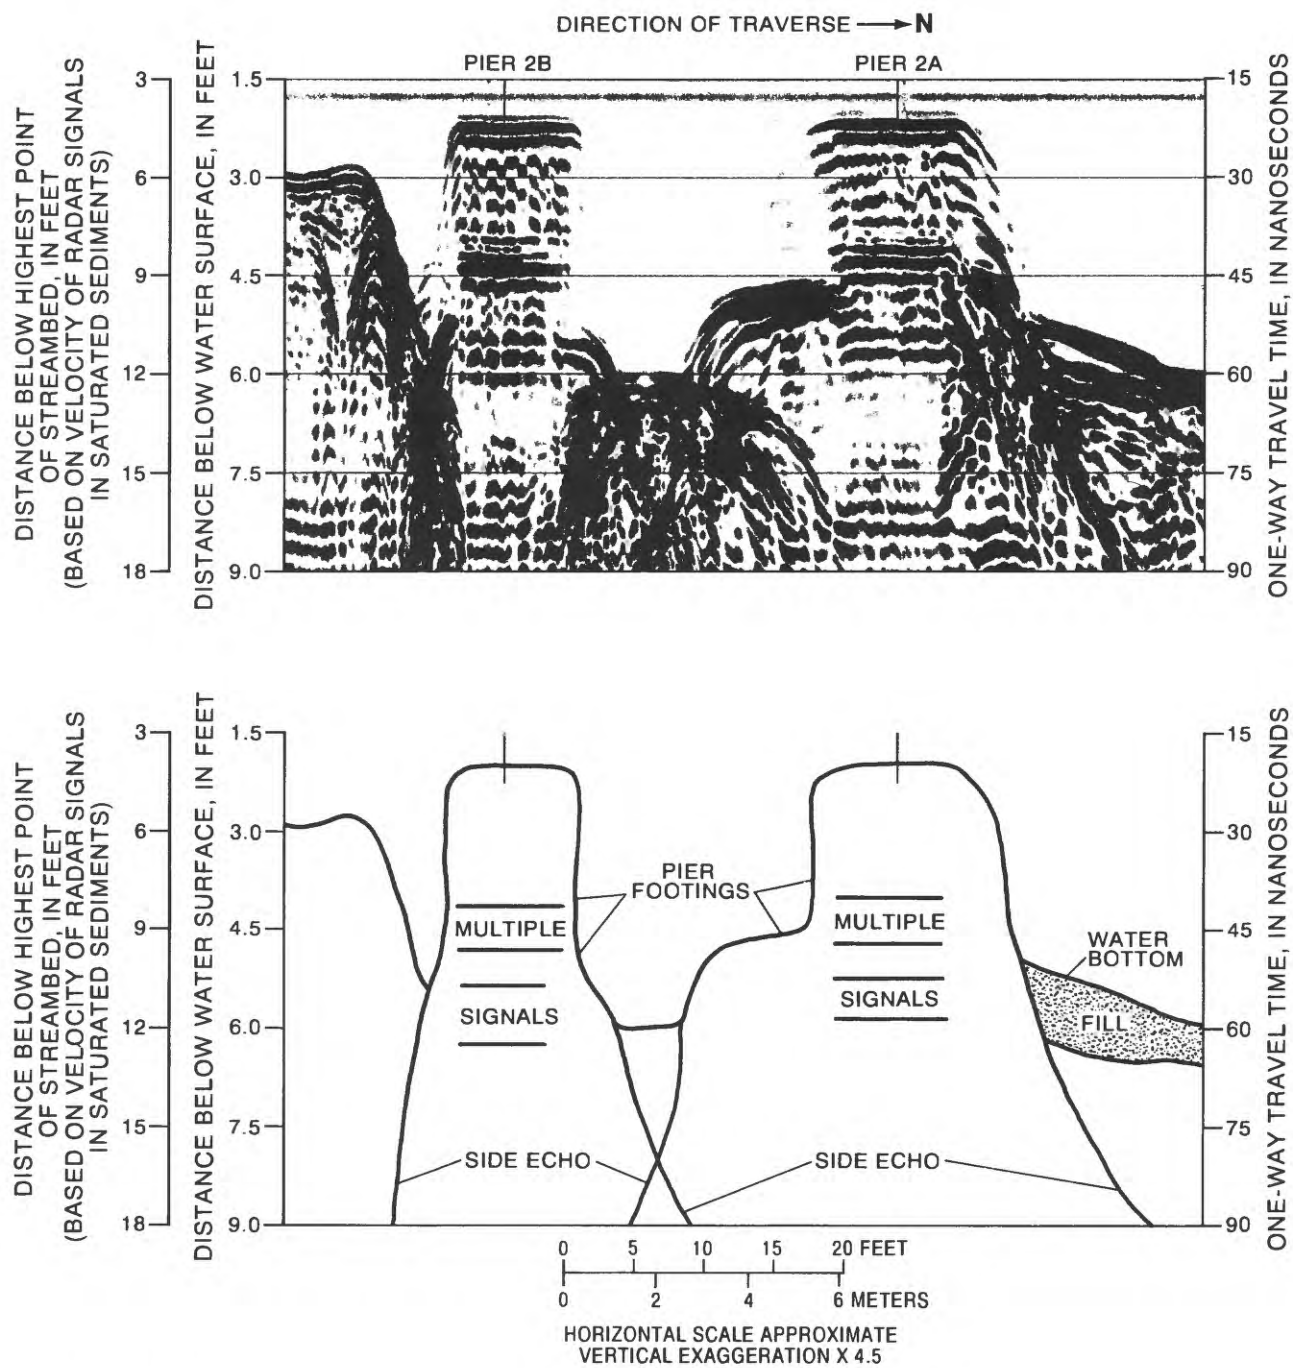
Ground-penetrating-radar record and interpretation, Sandy River Bridge 6875A, 1 foot east of pier 2.
